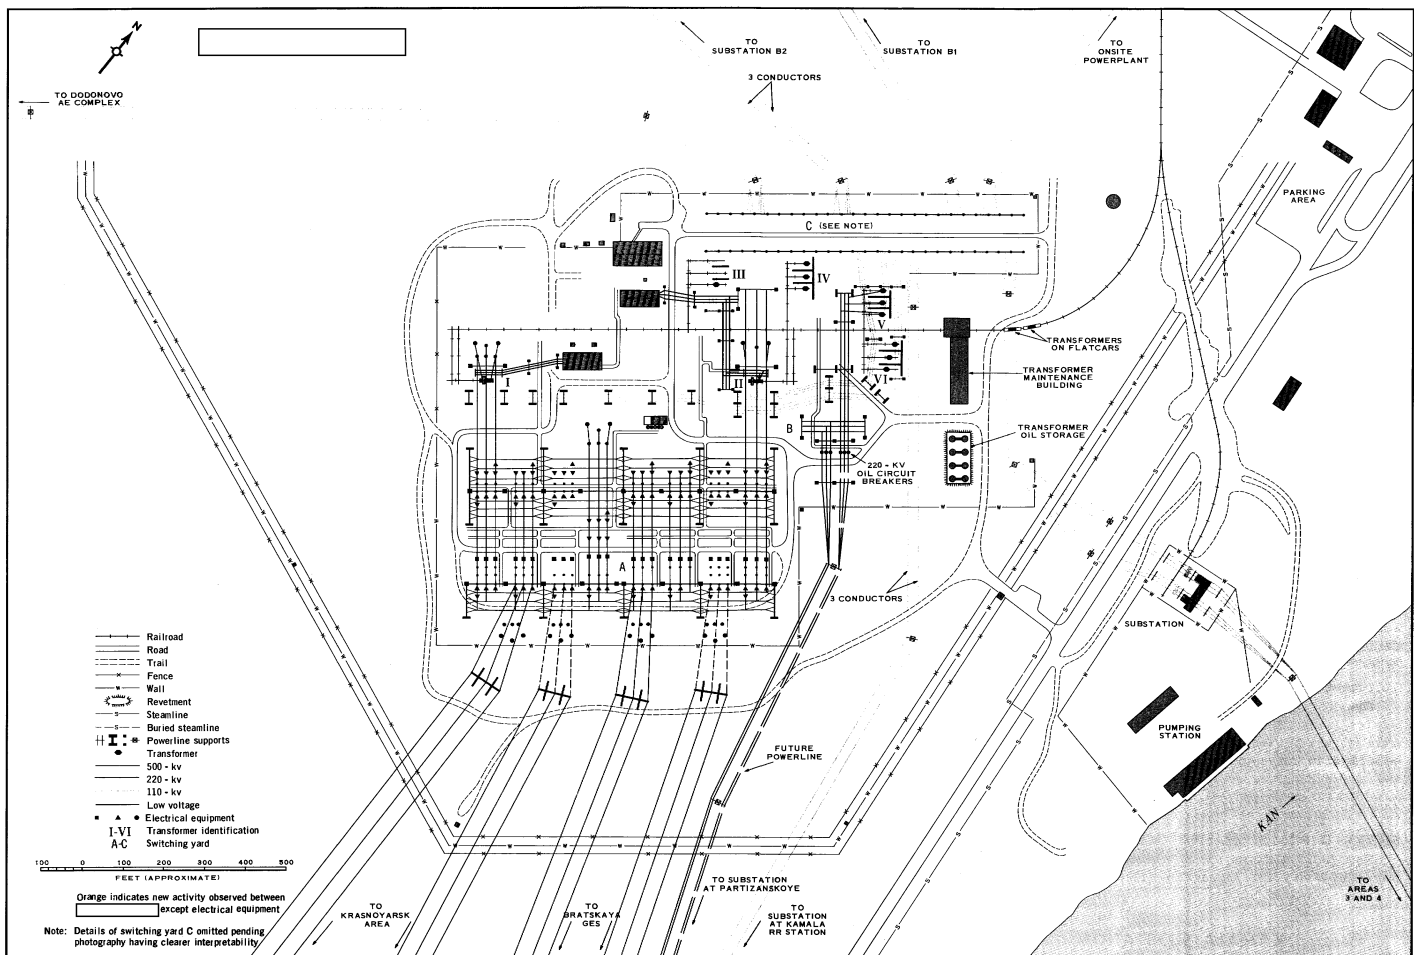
LAYOUT OF KAMALA SUBSTATION.
